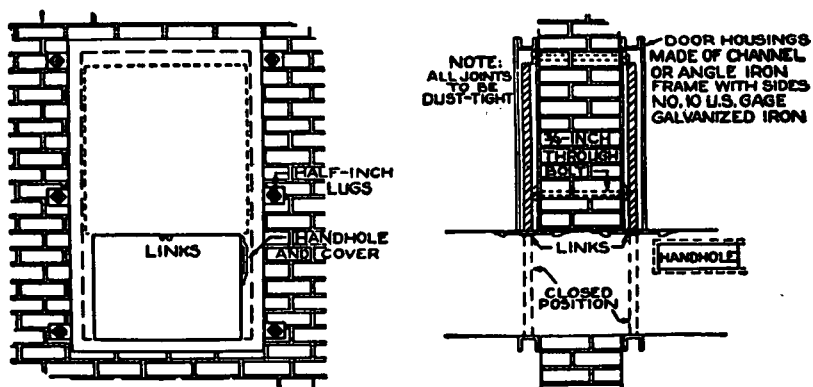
Suggested type of vertical fire door for duct passing through opening in fire wall.
